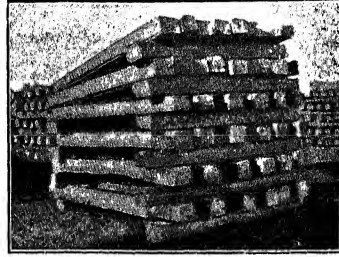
Convenient method of piling or stacking sleepers with roof.
